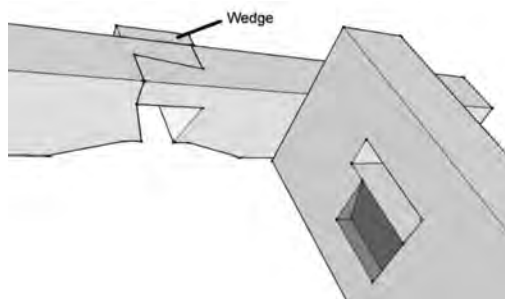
Clevedon, Dowlais Farm, wedged dovetail tenon joint (drawing, Dave Taylor)
